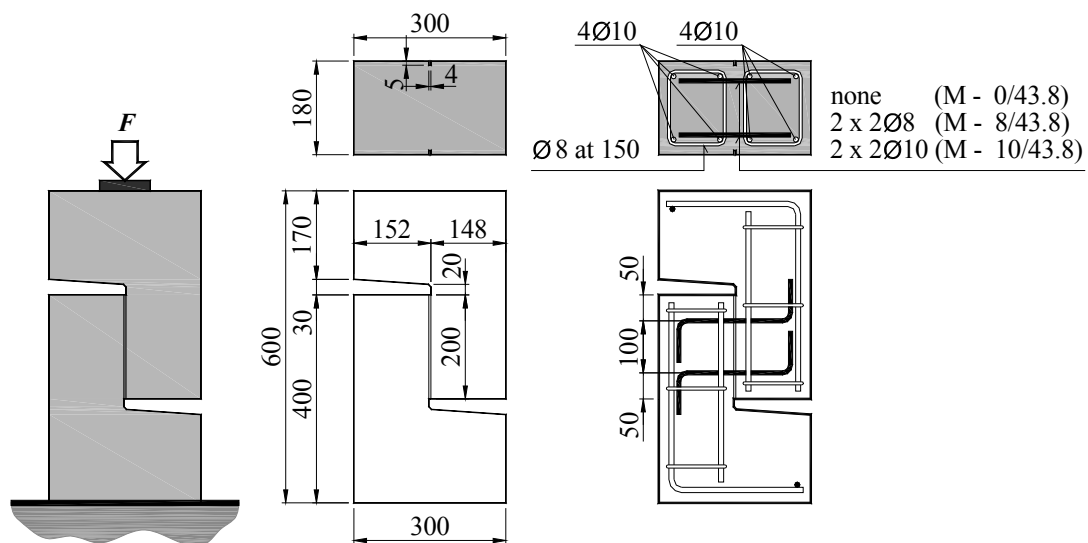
Dimensions, shape and reinforcement of the test specimens
